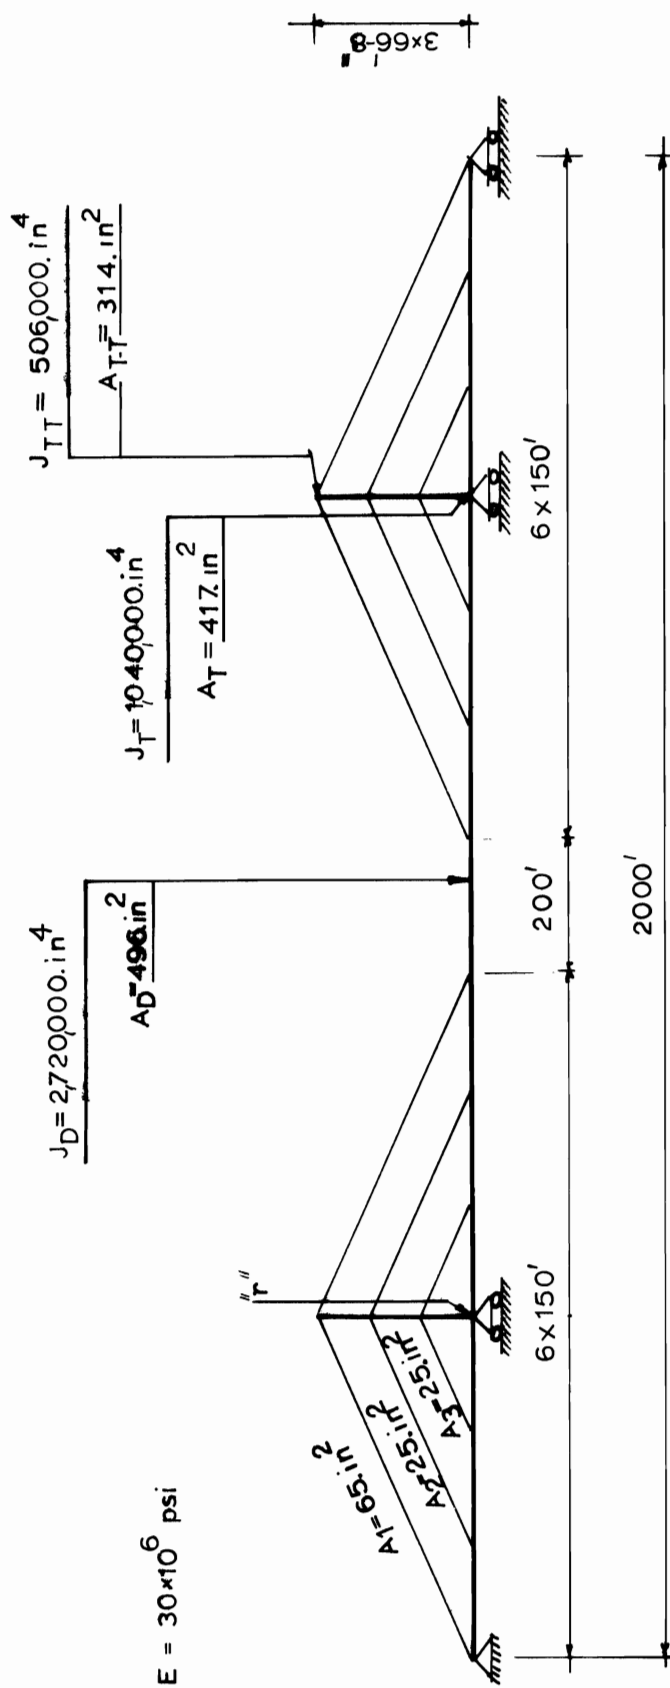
BRIDGE SYSTEM SUBJECTED TO DEAD LOAD AND POST-TENSIONING FORCES IN CABLES.
